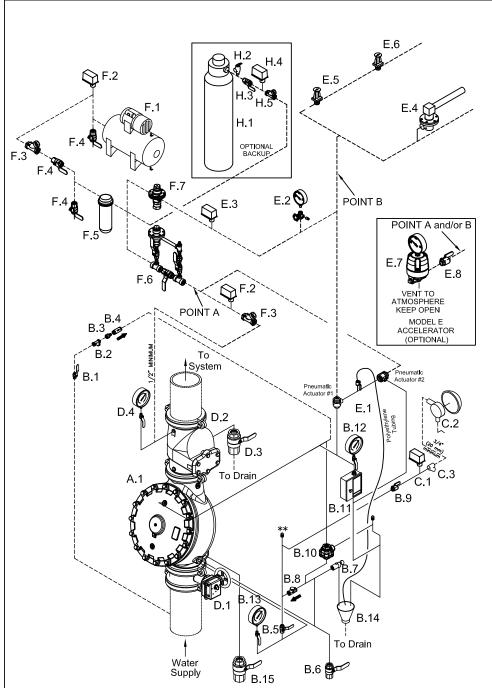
Angle Style Valve with Tank-Mounted Compressor (6" Valve Shown)
